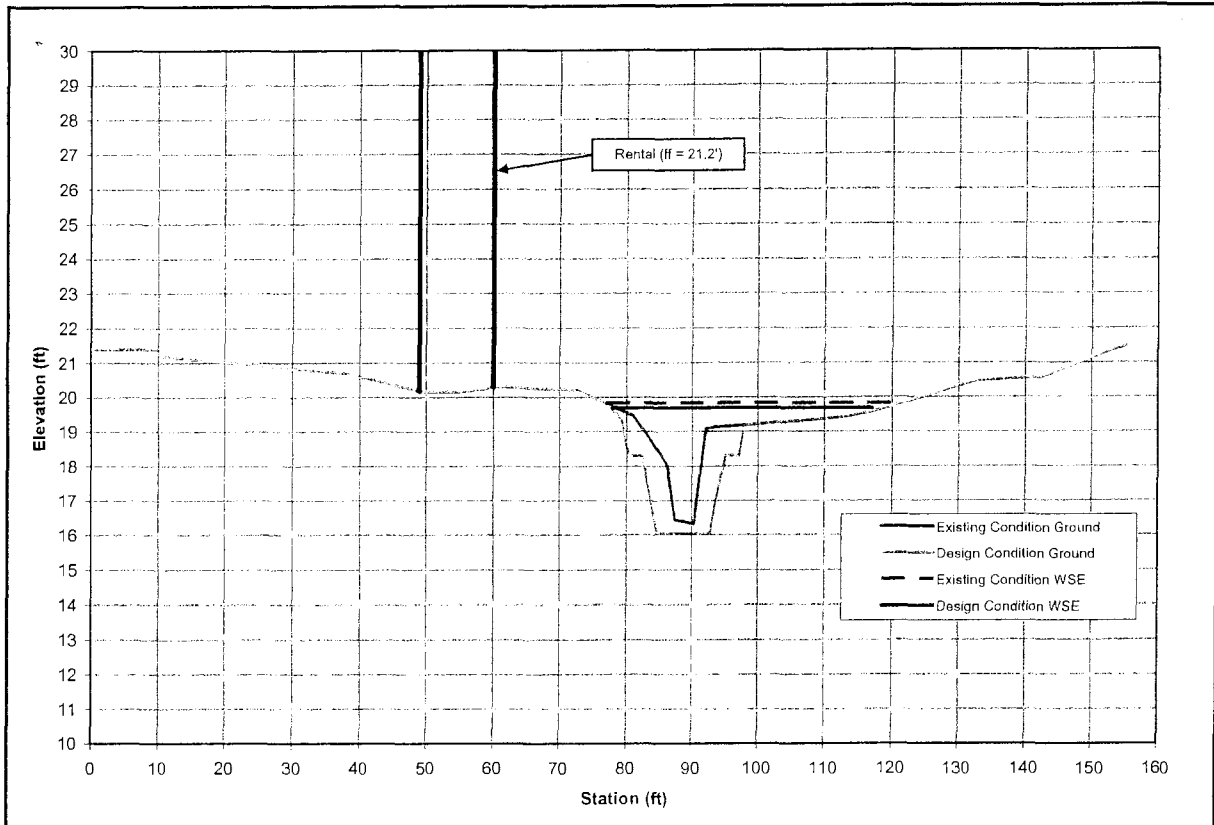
Cross-section 5905 showing existing and design condition water surface elevations (WSE) at 5-yr flood ( $Q_5 = 201\text{cfs}$ ).
